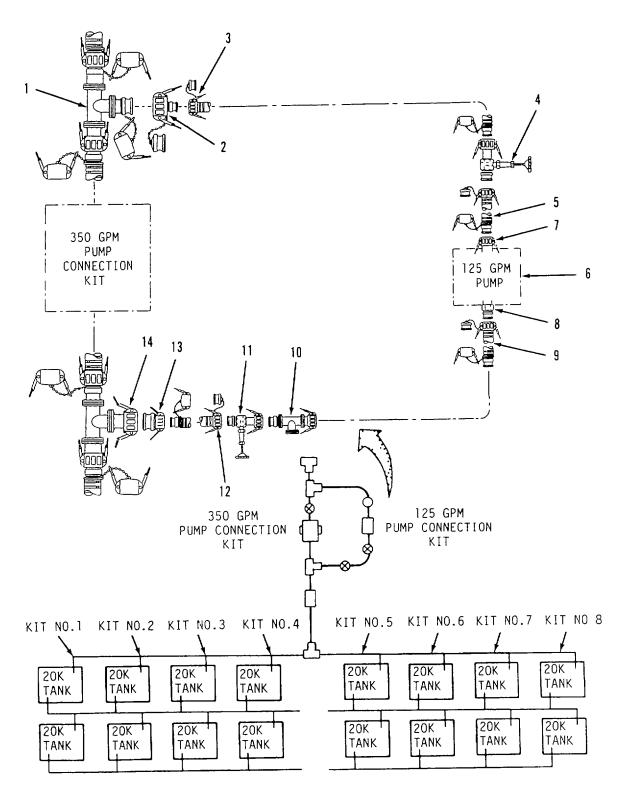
125 GPM Pump Assembly Connection Kit (Water Source).
